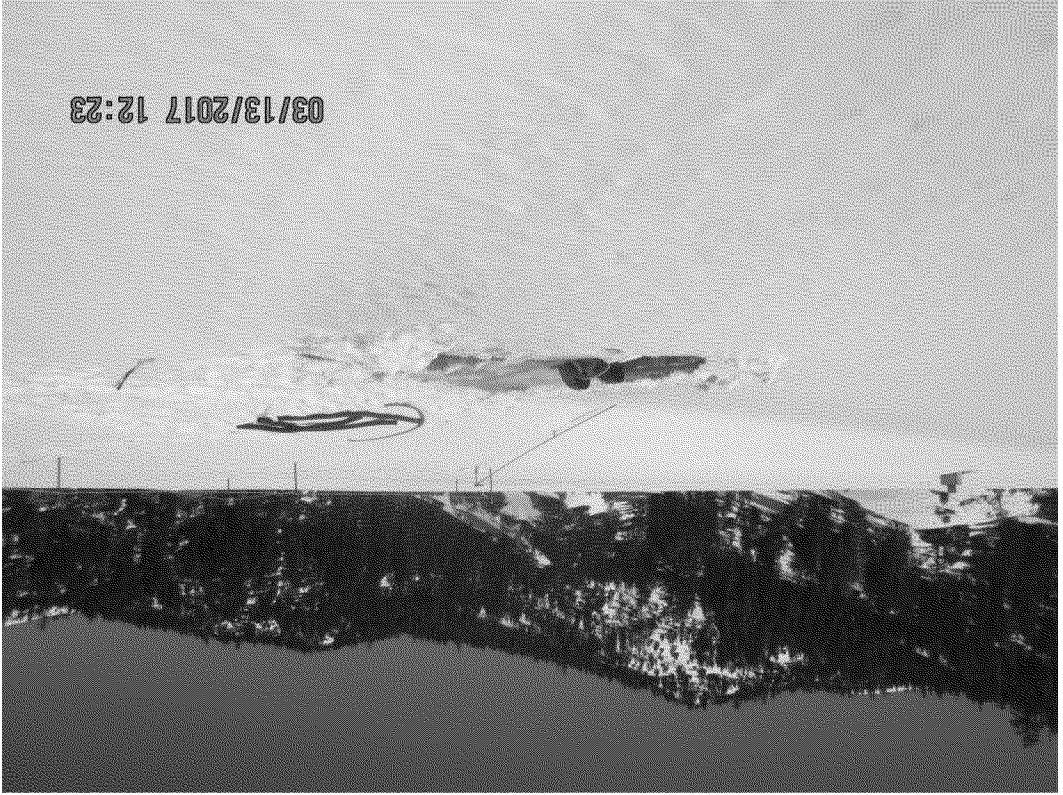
Siphon from Pond 2 South overflow to Pond 3 and RCTS
